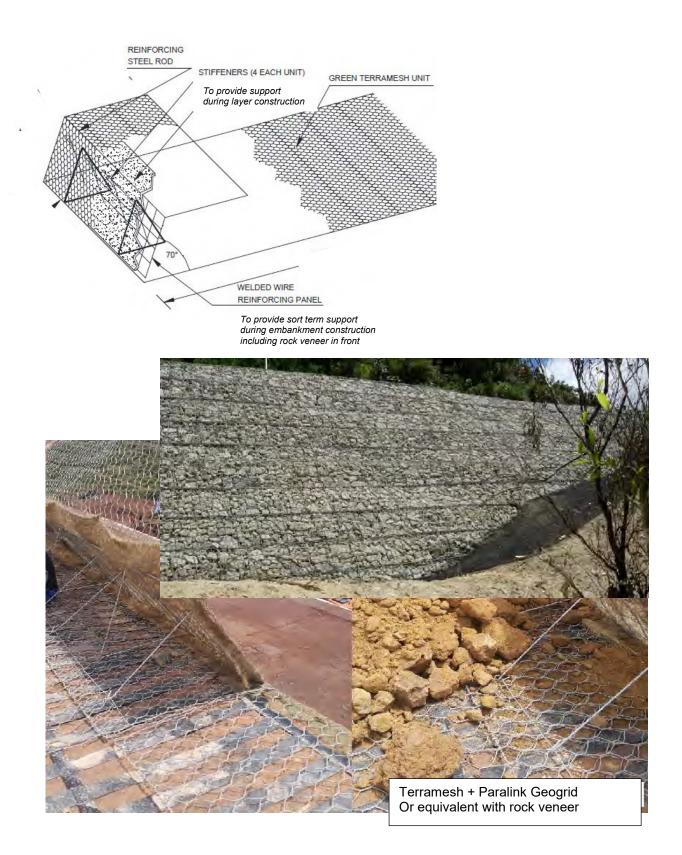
Typical details of Terramesh or equivalent facing with rock veneer
